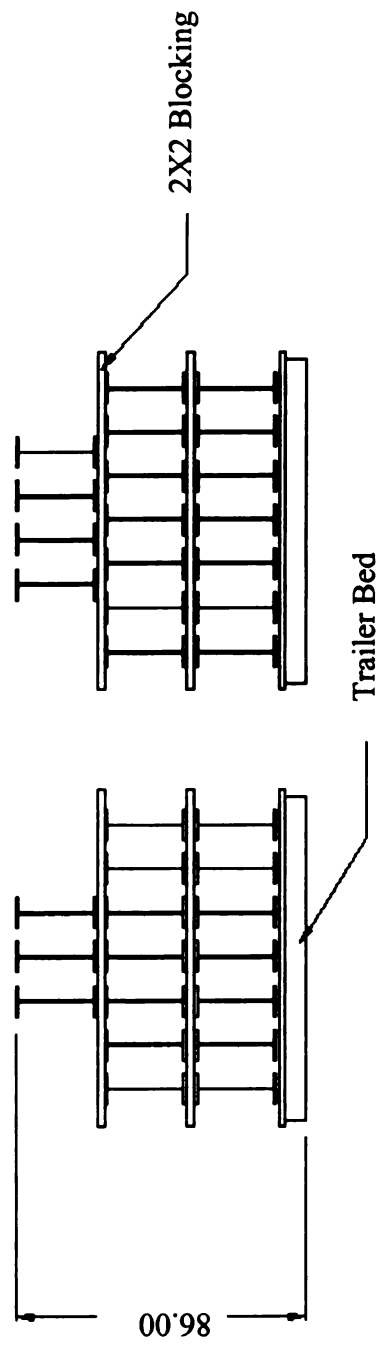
Drawing of truckload for steel with 10 inches as nominal height
